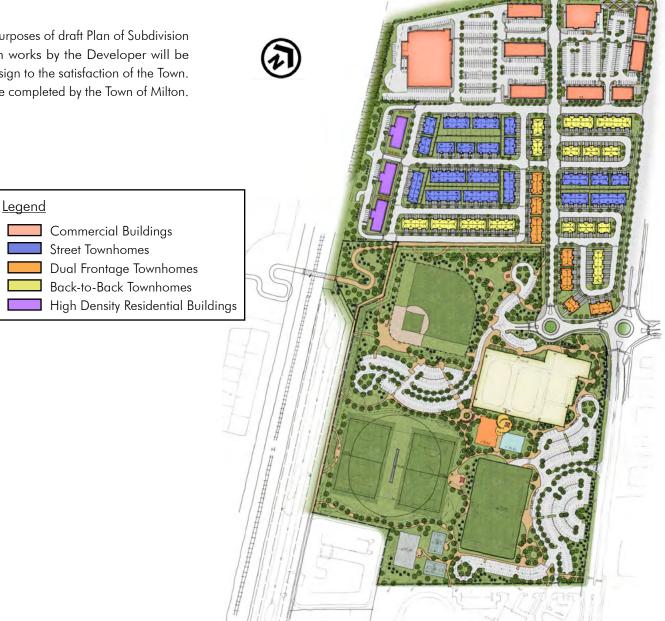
Consolidated Mixed-use Node Plan and District Park Vignette
